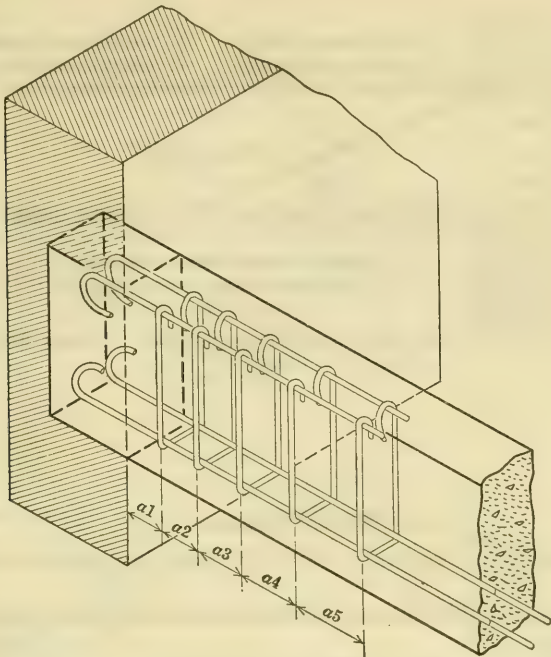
TYPICAL REINFORCED CONCRETE BEAM WITH ANCHORED LONGITUDINAL BARS AND VERTICAL STIRRUPS.
